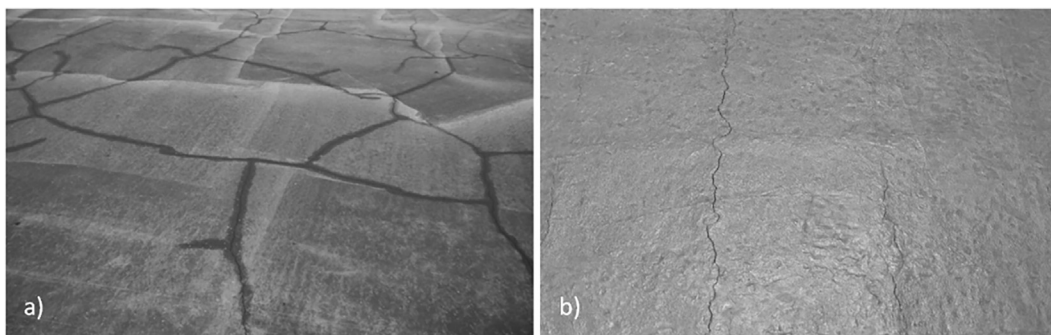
Plastic shrinkage cracking patterns. a) Crazed crack pattern [10]. b) Crack pattern linked to steel reinforcement layout.
